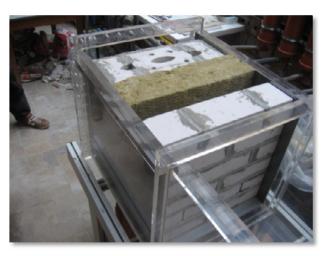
Composite wall construction; double shell masonry of sand-lime bricks with heat insulation.
